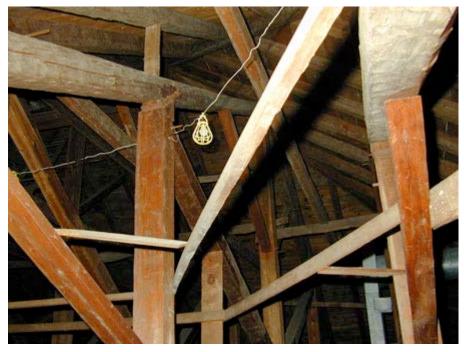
Roof details under the hipped roof. Note the size of the original timbers
